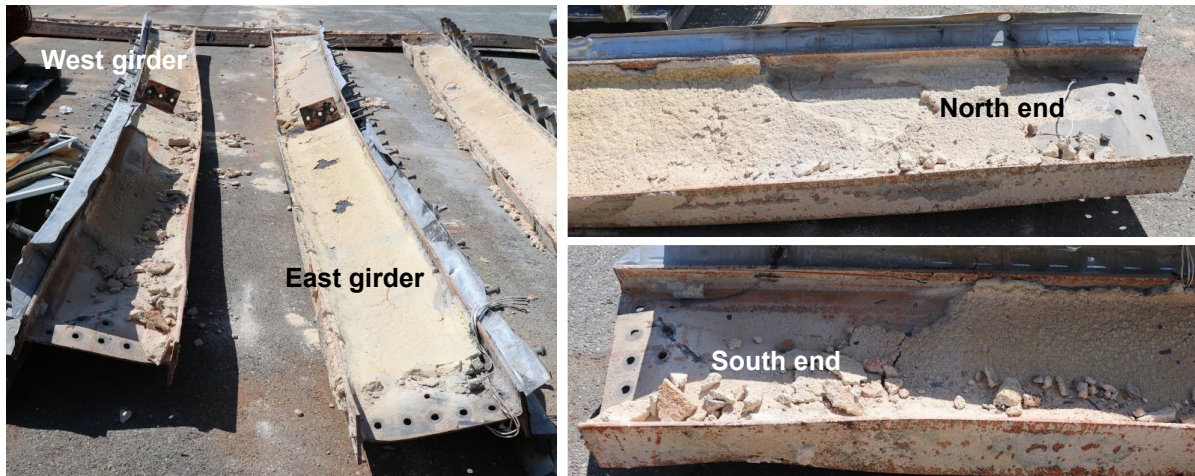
Post-test photographs: Test-bay girders (left) and north and south ends of the west girder (right).
